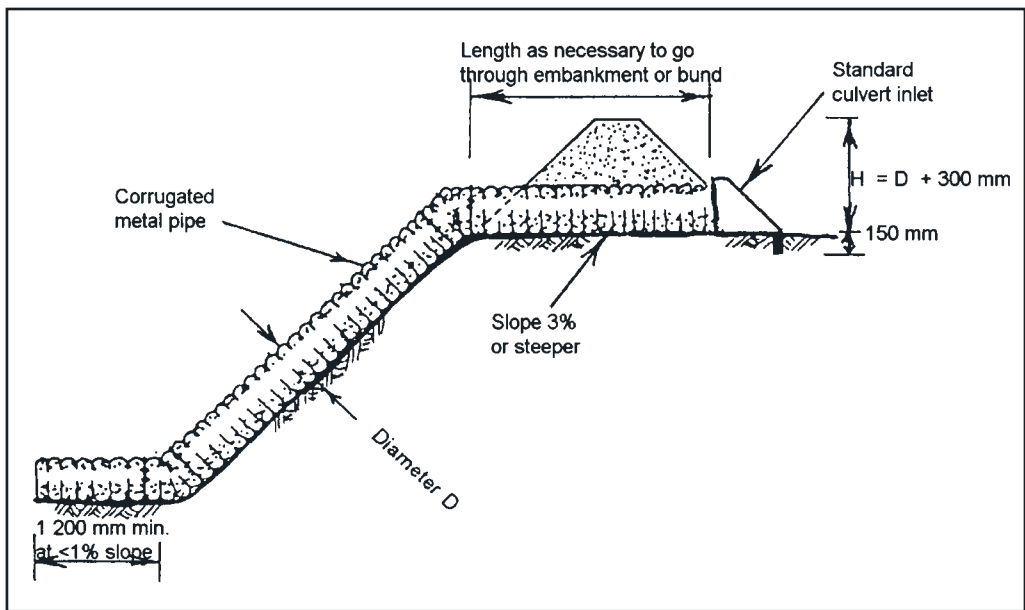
Cross-section of a typical pipe drain (adapted from USDA, 1975).
